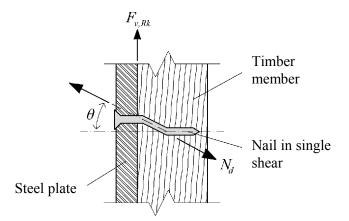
Connection with dowel type fastener in single shear at the failure condition
